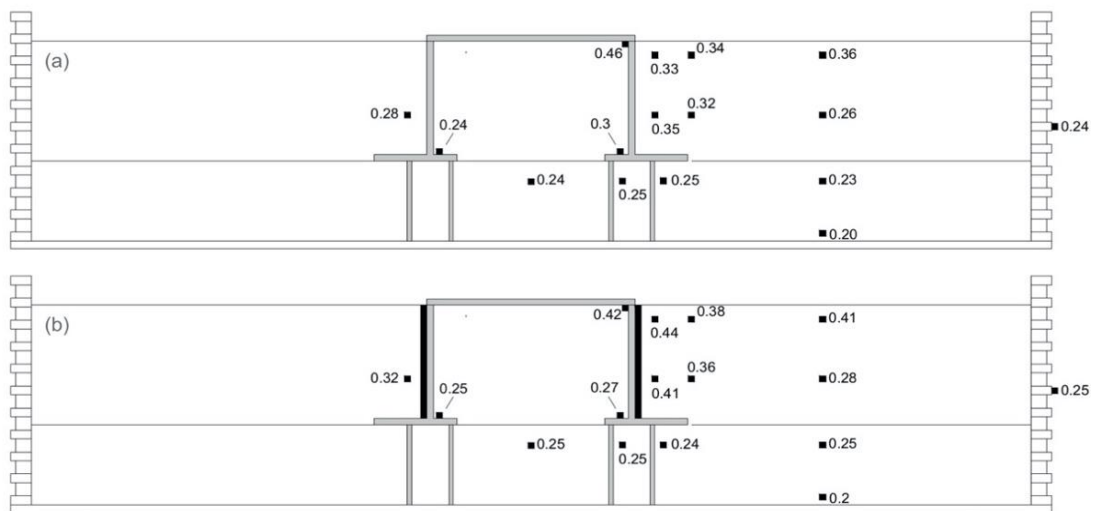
Maximum accelerations recorded by the sensors positioned in the backfill soil and on the bridge; comparison between two cases with piles connected to the foundation: without (a) and with (b) compressible inclusion layer behind the abutment wall (adapted from Fiorentino et al. 2019b)
